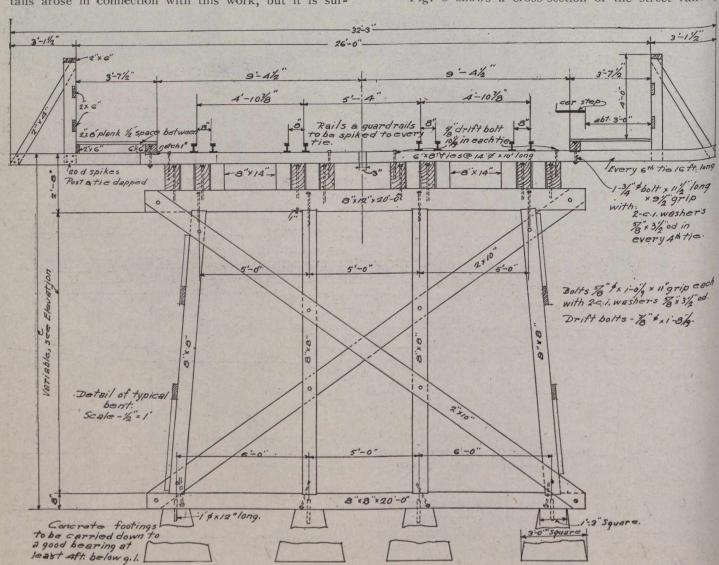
Cross-section of C.P.R. Trestle; Floor of the Sidehill Trestle is the Same Construction.
